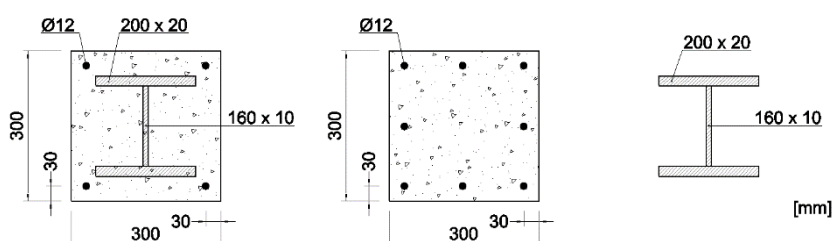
(FROM LEFT TO RIGHT) CROSS-SECTION OF A COMPOSITE COLUMN, REINFORCED CONCRETE COLUMN AND STEEL COLUMN
